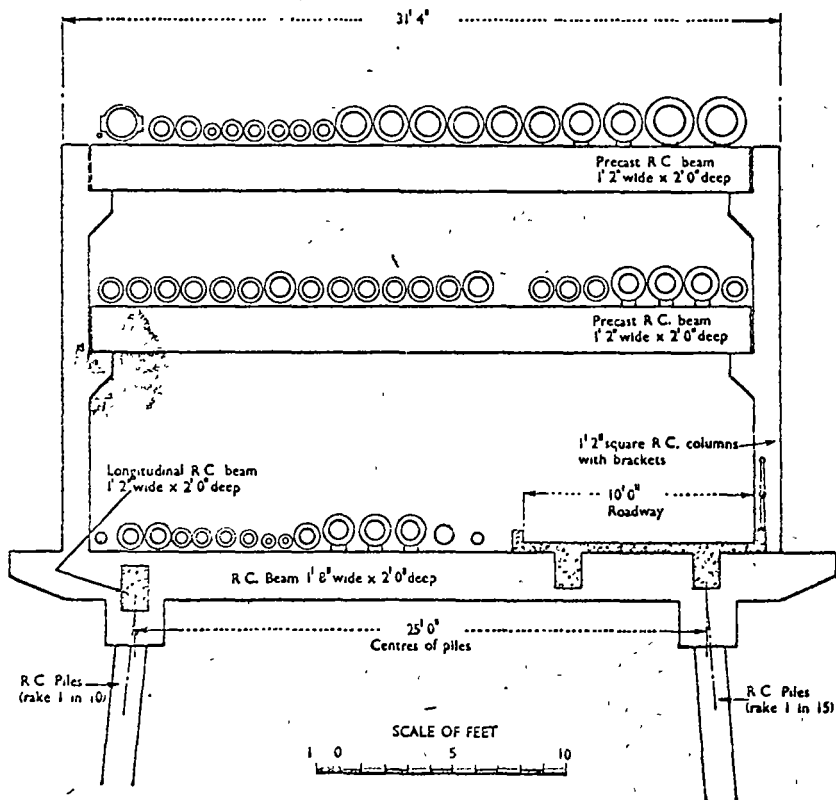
TYPICAL SECTION THROUGH JETTY APPROACH
